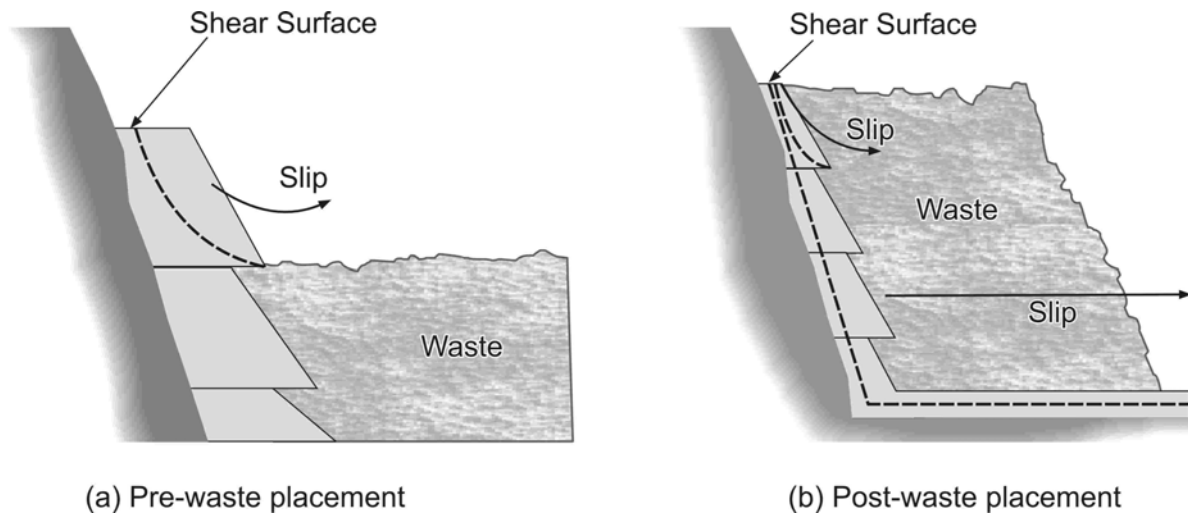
Possible slope failure modes of steep wall barrier systems
